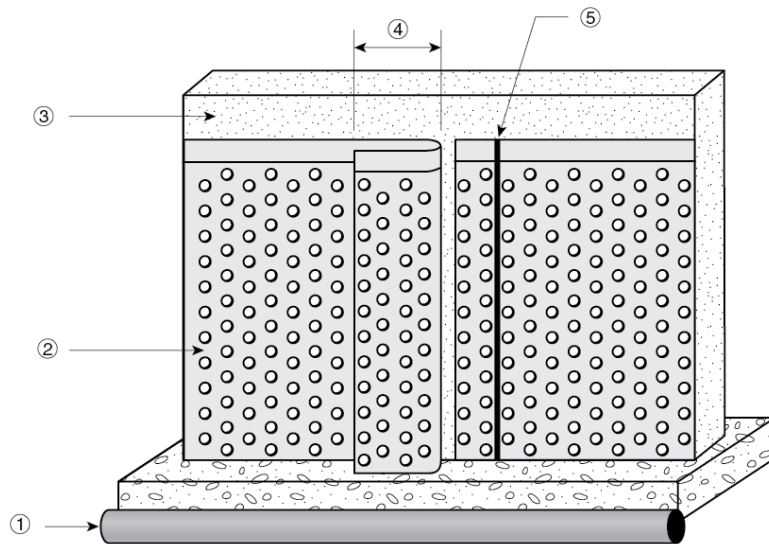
Installation of “DMX Drain 5M (Dampproofing)”:
